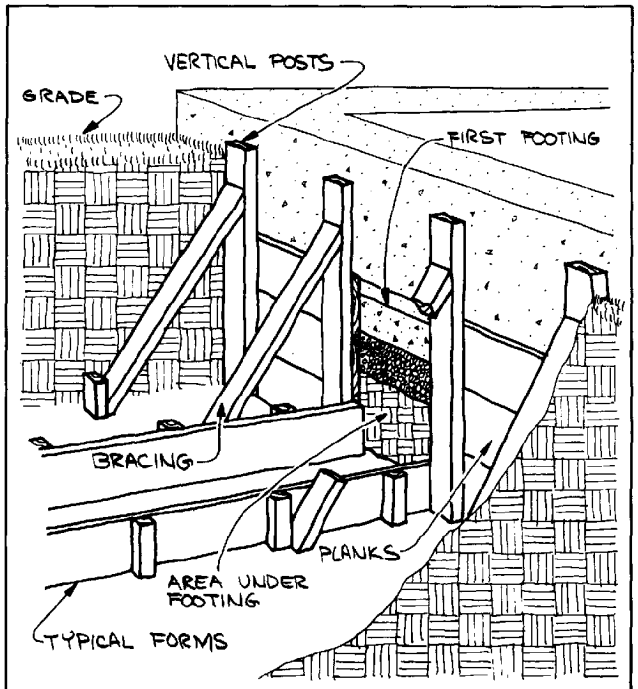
Stepped footings. Where the new footing lies below the level of the old, simple shoring should be used to prevent undermining of the existing foundation.
